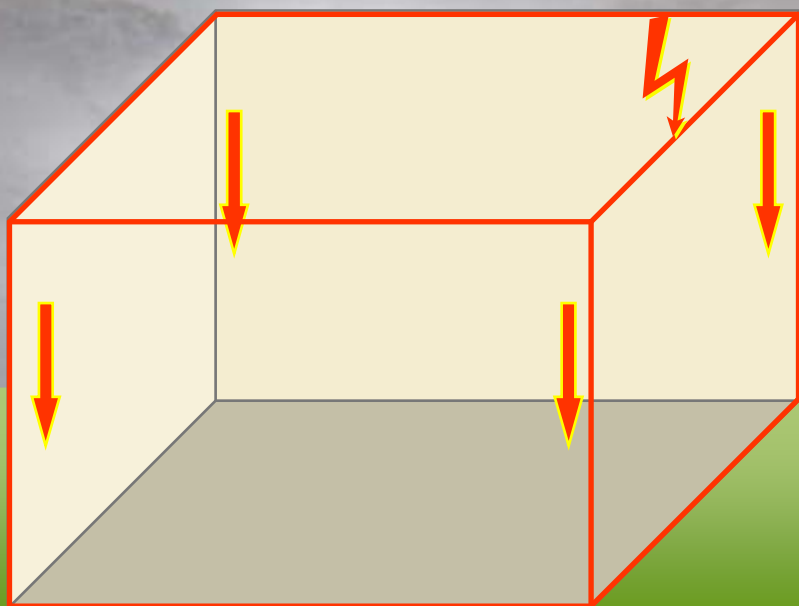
Equipotential bonding in a structure with a steel reinforcement
